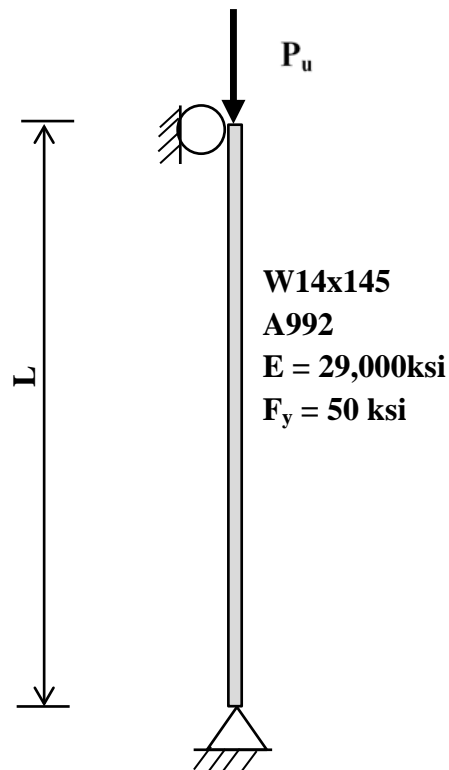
Geometry, Section Properties, Material Properties, and Loading Conditions of A Single Column Study
